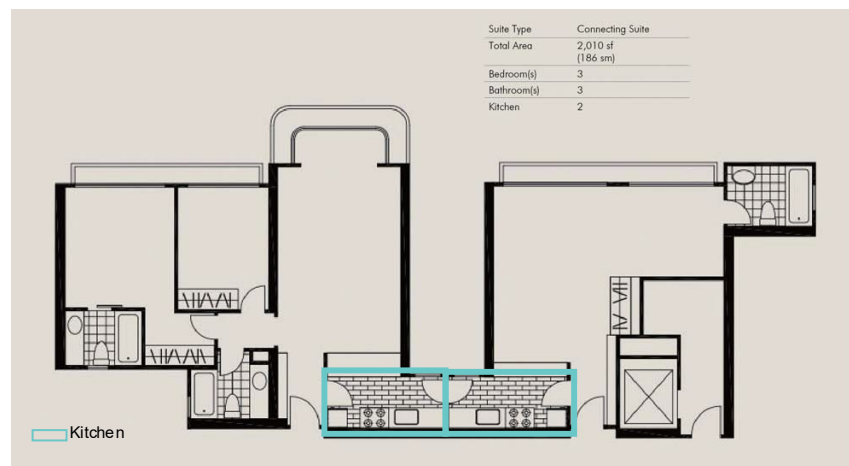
Floor Plan Dual-Kitchen Arrangement in Hong Kong Parkview (Apartment-like Serviced Apartment)⁹
